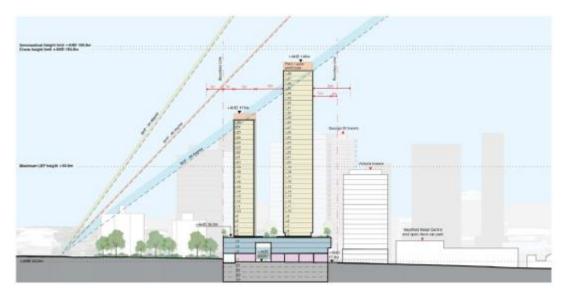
Proposed 2 tower scheme, facing south (Source: 'Urban Design Report', Architectus, (13 October, 2017) p.61)
